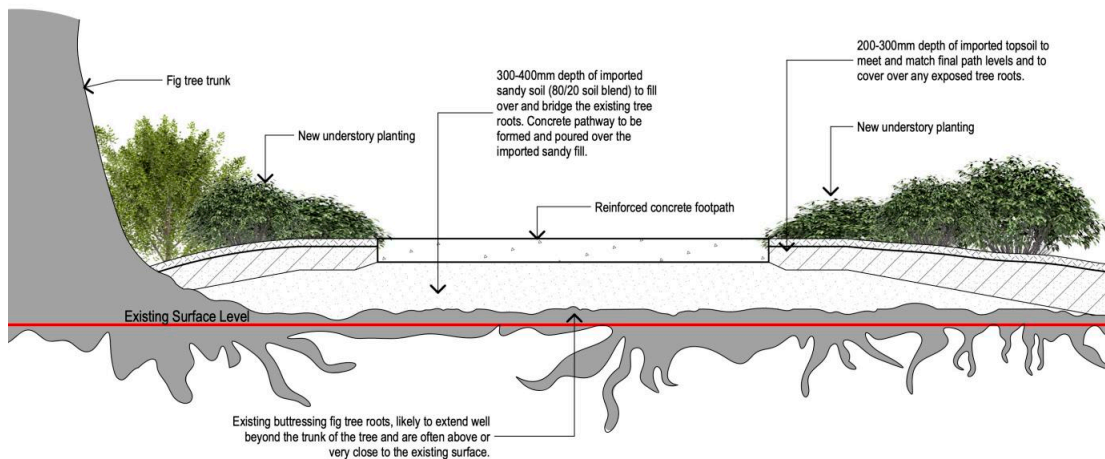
Detail example of proposed concrete footpath over existing Fig tree roots, ensuring 300-400mm of sandy soil over the existing roots to protect them from disturbance (Photo: Arterra).
